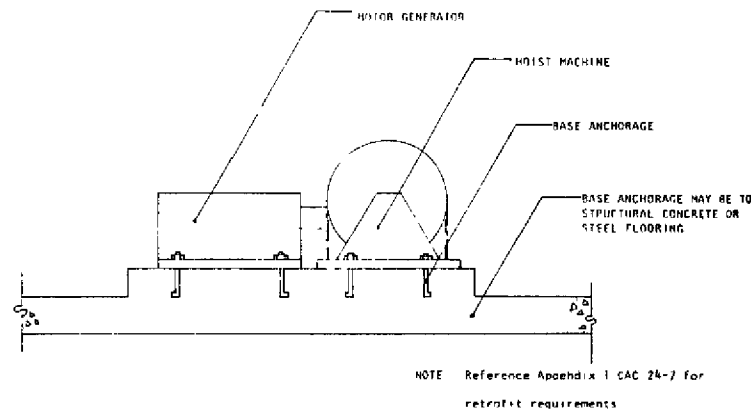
Elevator systems. Installation of geared and gearless hoist machines
